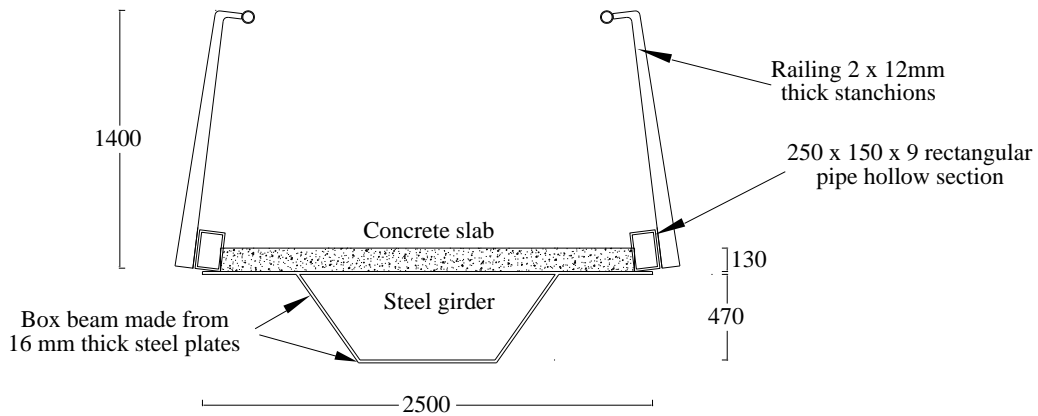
Cross-section of bridge deck (all dimensions in mm).
